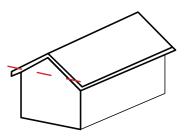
Illustration No. 16-1	Accessory Building or Structure Shared or Party Driveway Easement
